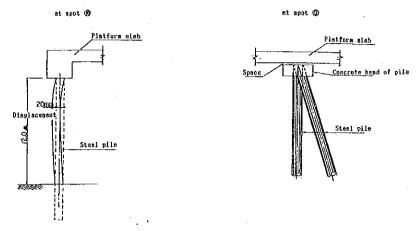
Detail of Deformed Spots at Berth No. 11
